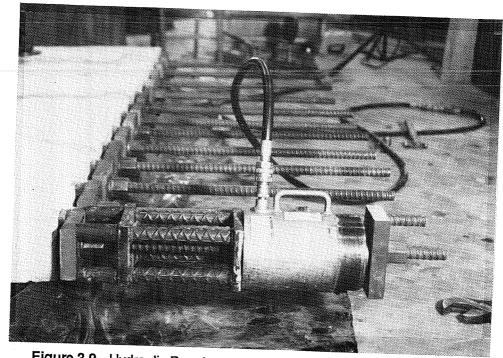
Hydraulic Ram Loading Anchor With Dywidag Threaded Bar
